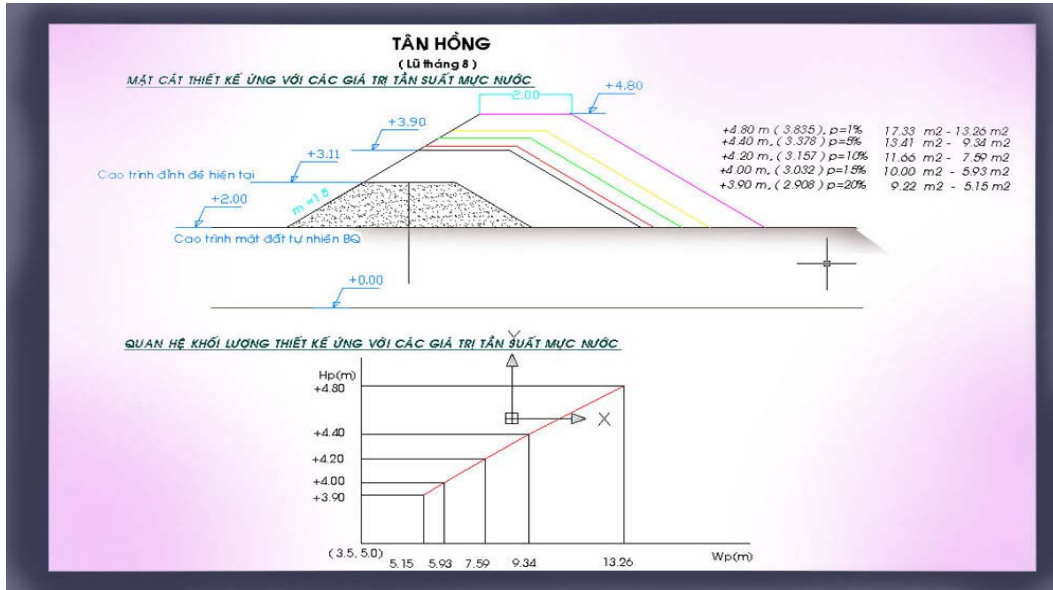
Typical cross-section of embankment for Tan Hong district
